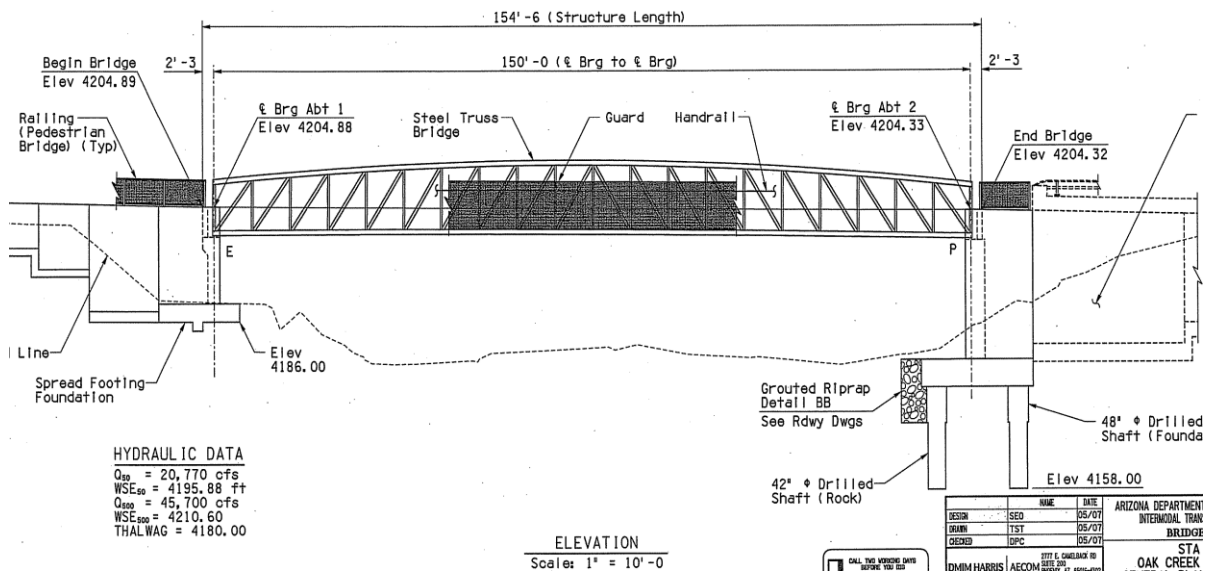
Elevation profile of the prefabricated pedestrian bridge.
